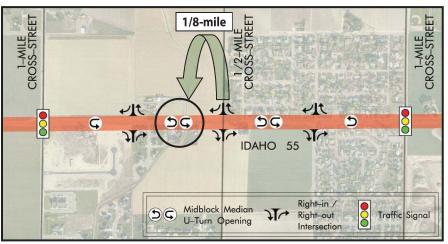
Rural median U-turn opening spacing – Snake River Bridge to 10<sup>th</sup> Avenue
